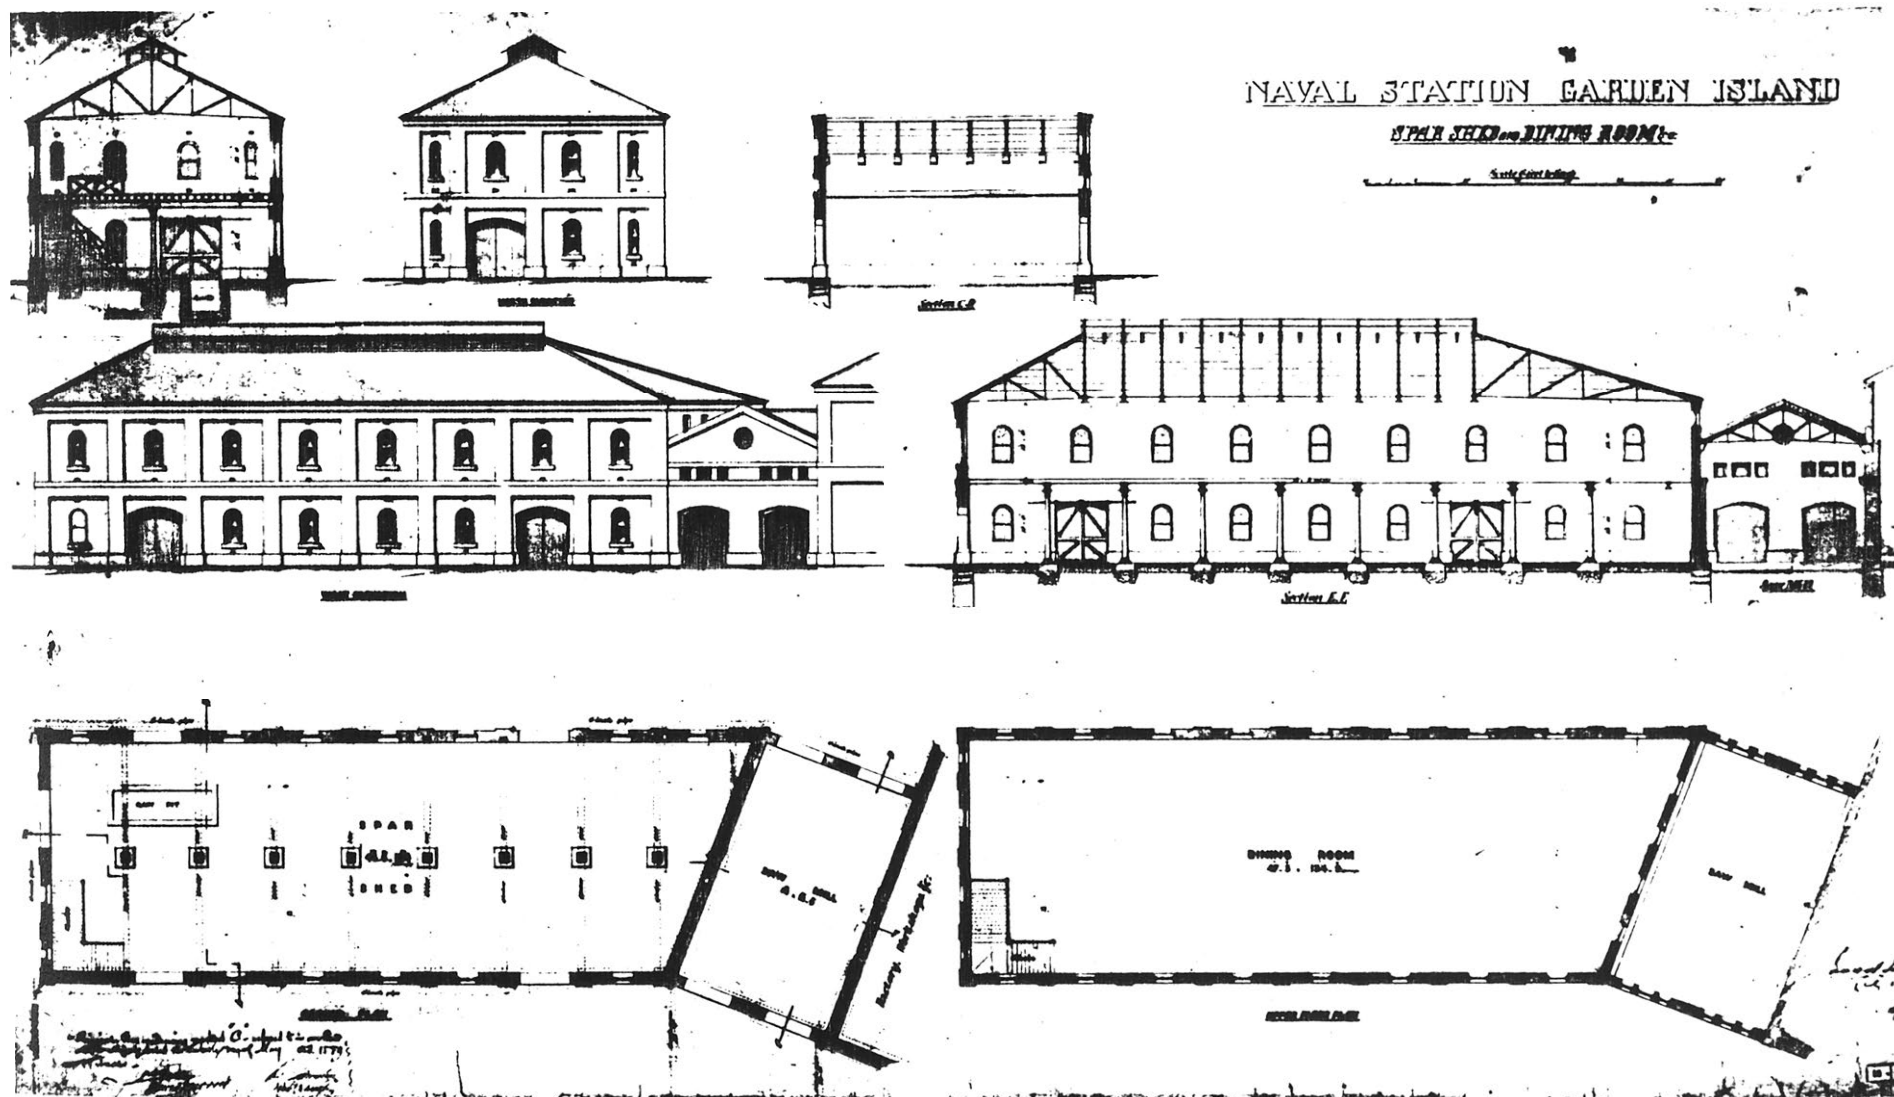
Spar Shed & Dining Room - Plan & Elevations, 1889
